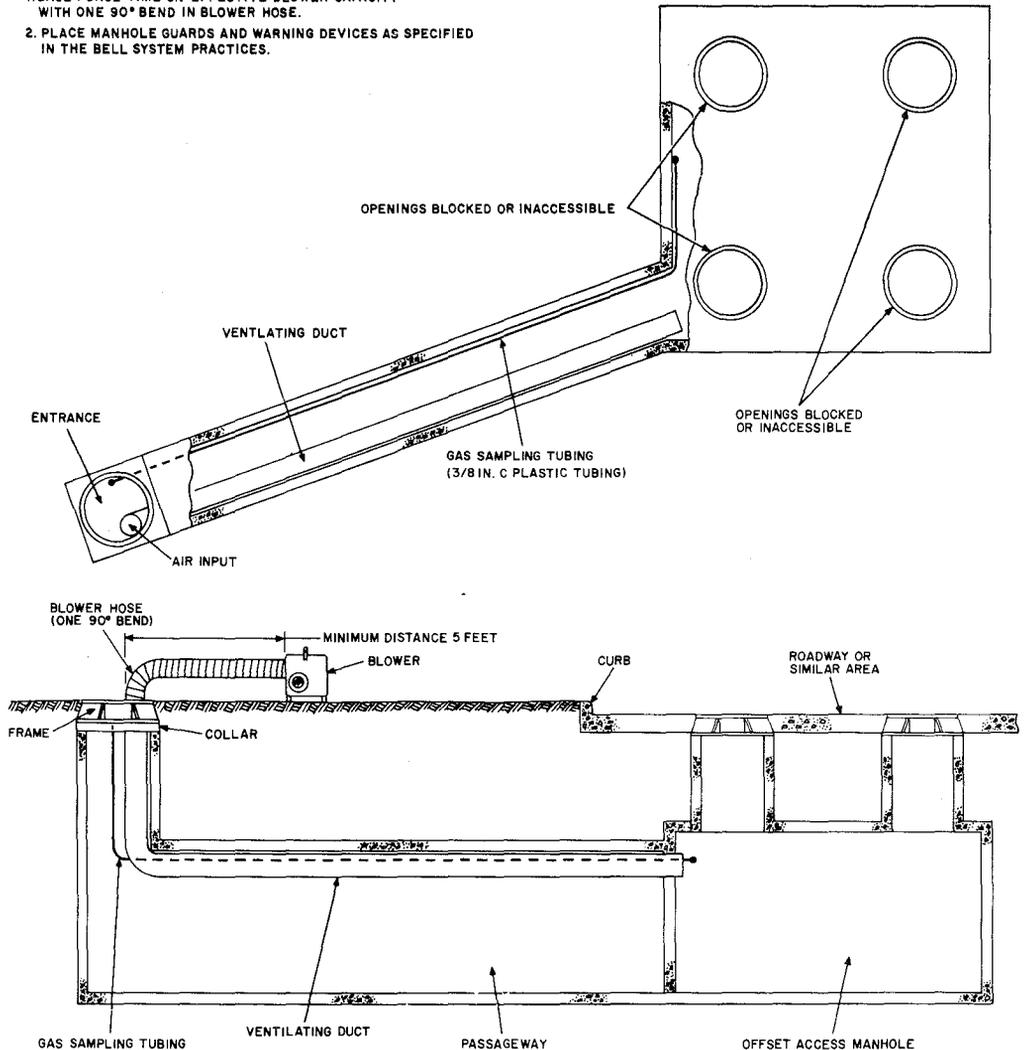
Typical Setup for Purging Offset Access Manhole With No Entrance Manhole
